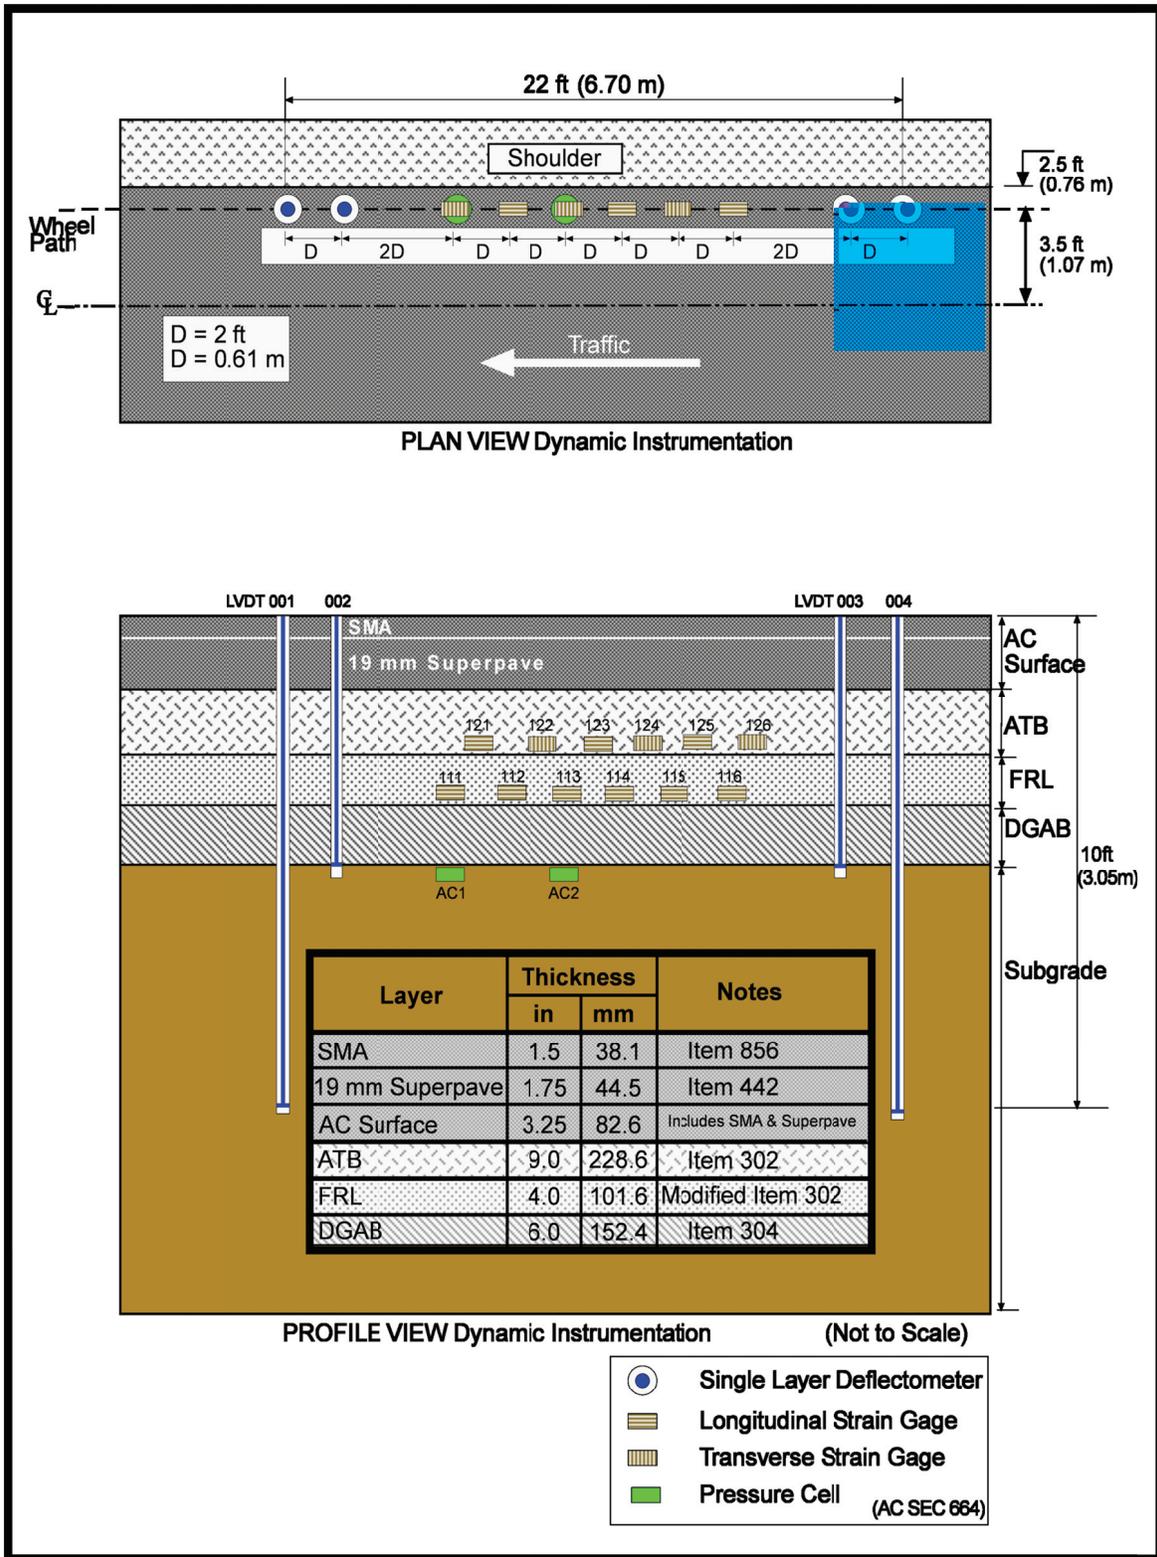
Instrumentation Plan and Profile Views for AC Section 664
